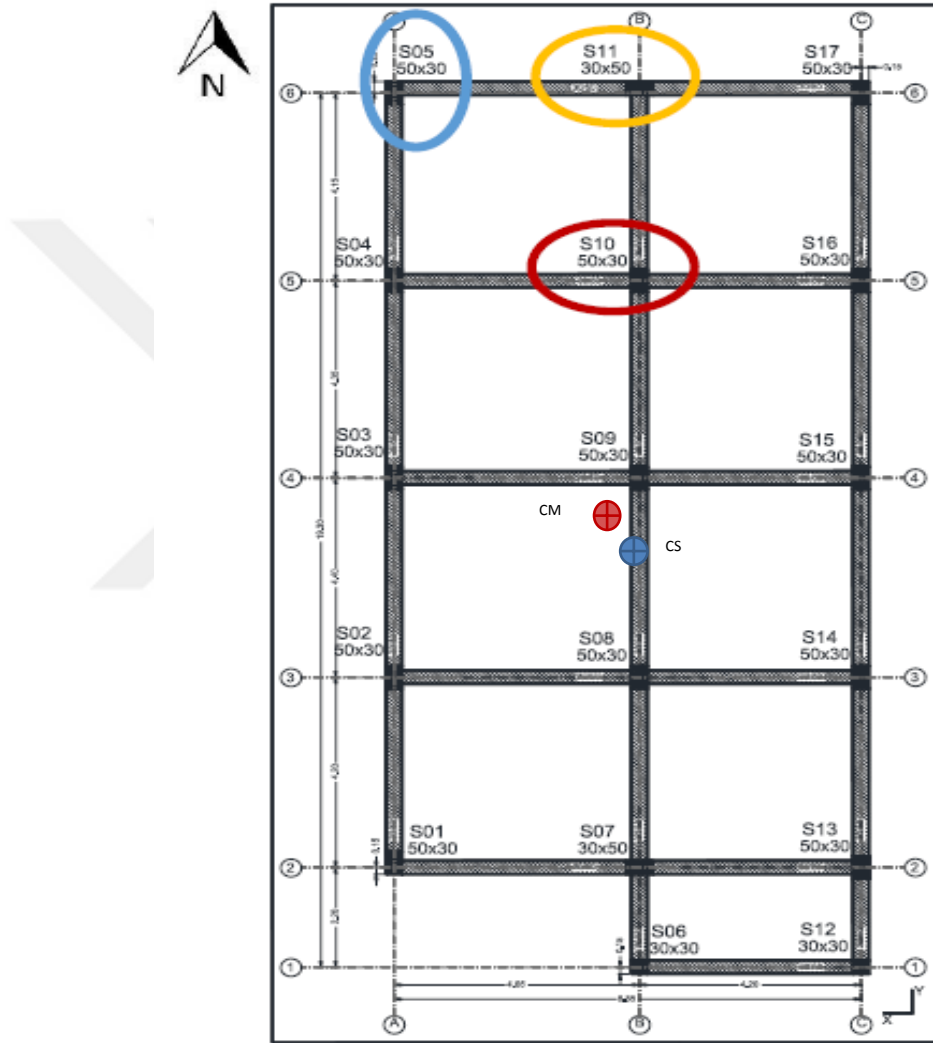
Specifications of Alaköy building (Taşkın et al. 2014).
